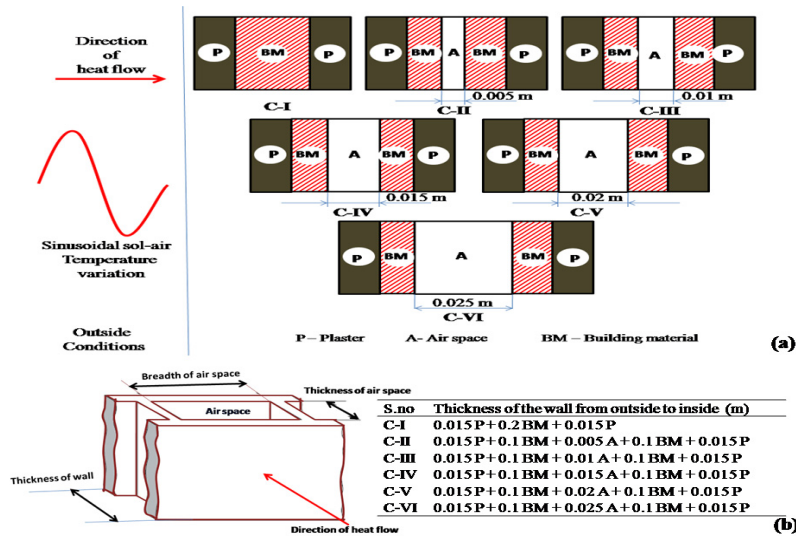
(a) Configuration of composite walls with different air spaces; (b) Wall structure with divided air space
